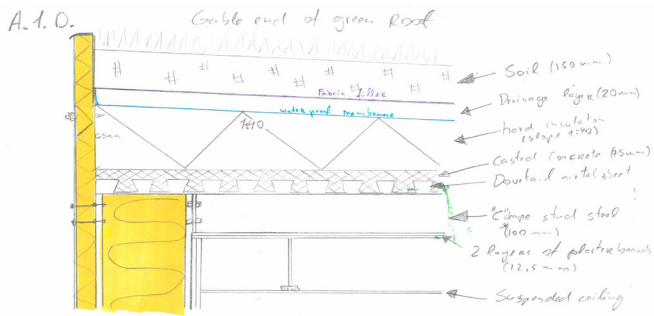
Sketch: Extension Green Roof connection with the extension wall
